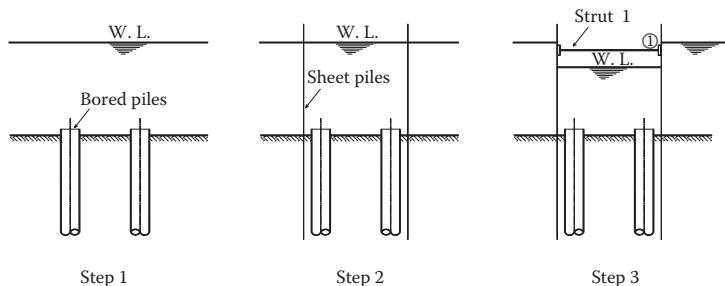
Steps 1, 2, and 3 of construction stages.
